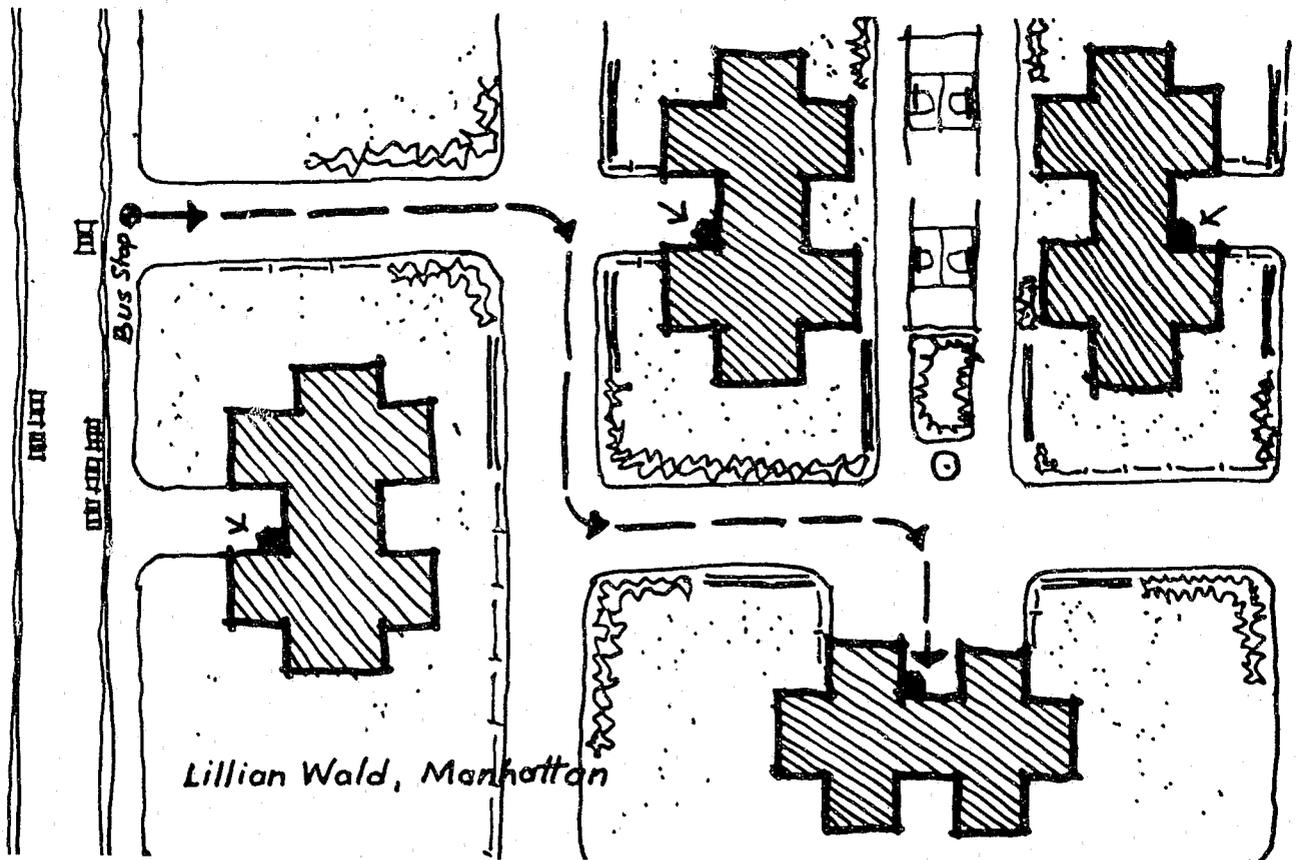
Lillian Wald Houses, New York. Sketch of grounds. Paths leading to buildings on the interior of project grounds twist and turn, often concealing danger.
